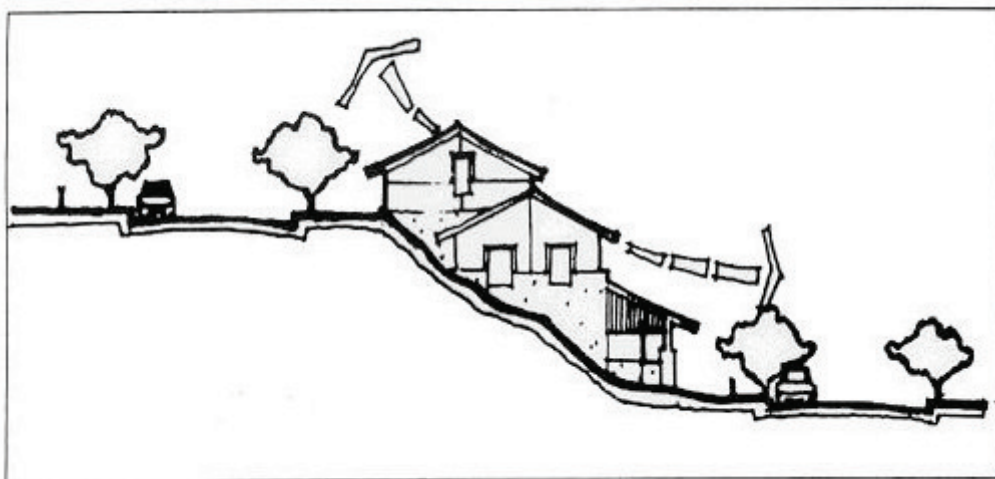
Dwelling houses stepping down steep sites minimising cut and fill
